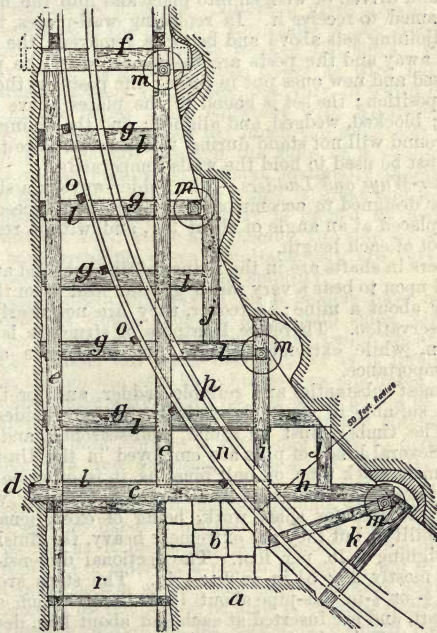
UNDERLAY MEETING VERTICAL SHAFT.
